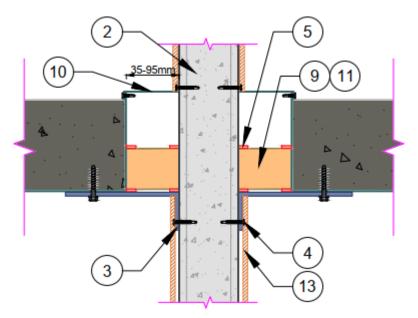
Dual wall system with vertical wall between horizontal walls – gap width of 35-95 mm between the stair and vertically oriented wall
